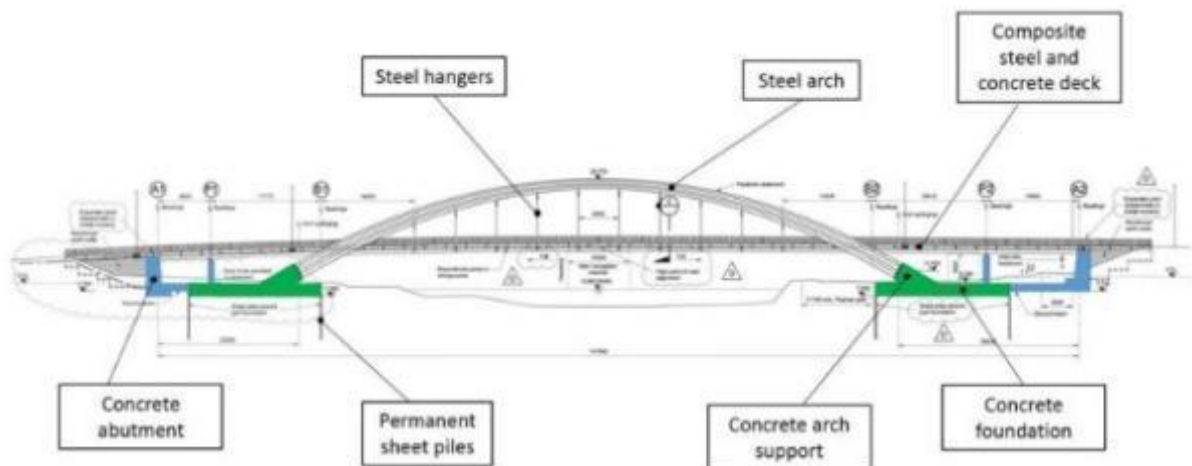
Side elevation of the bridge, illustrating principal engineering components
